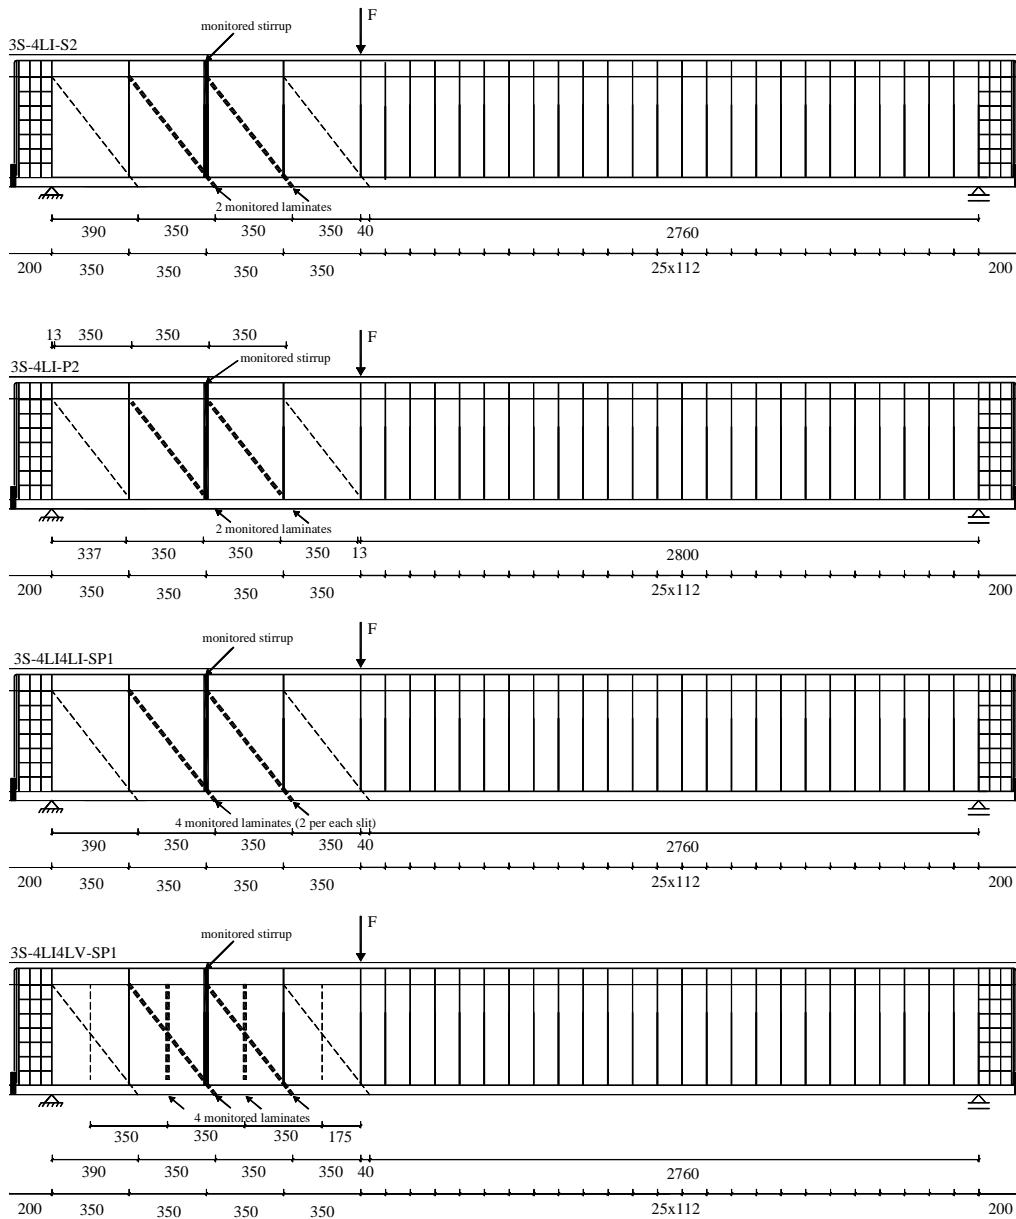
Localization of the monitored CFRP laminates and steel stirrups in the tested beams (dimensions in mm).
